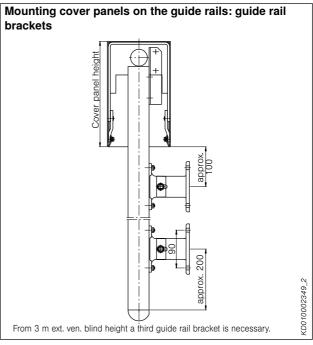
Position of the guide rail bracket for cover panels mounted on the guide rails
